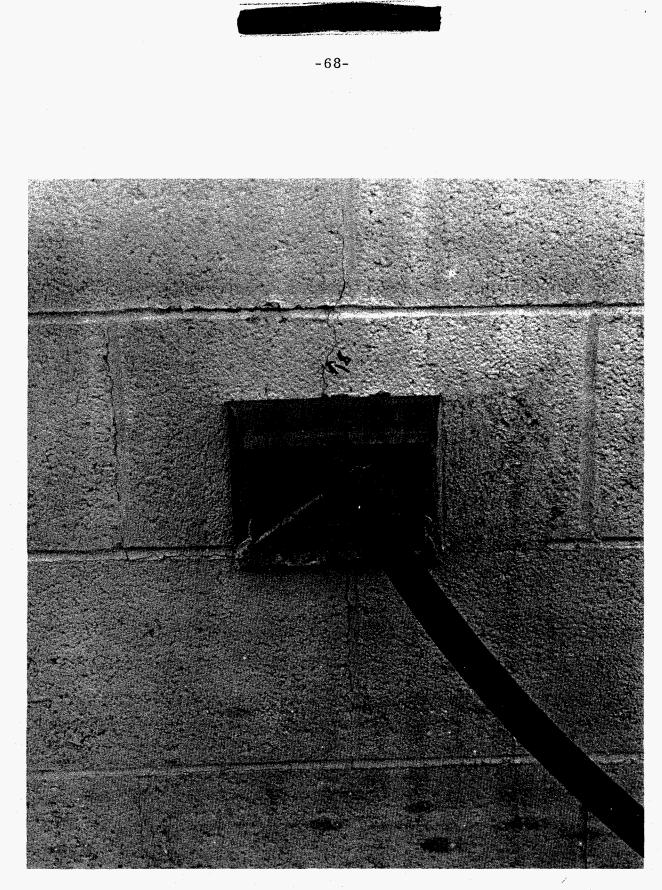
Building 790, west side, 0.13 cm/sec.
